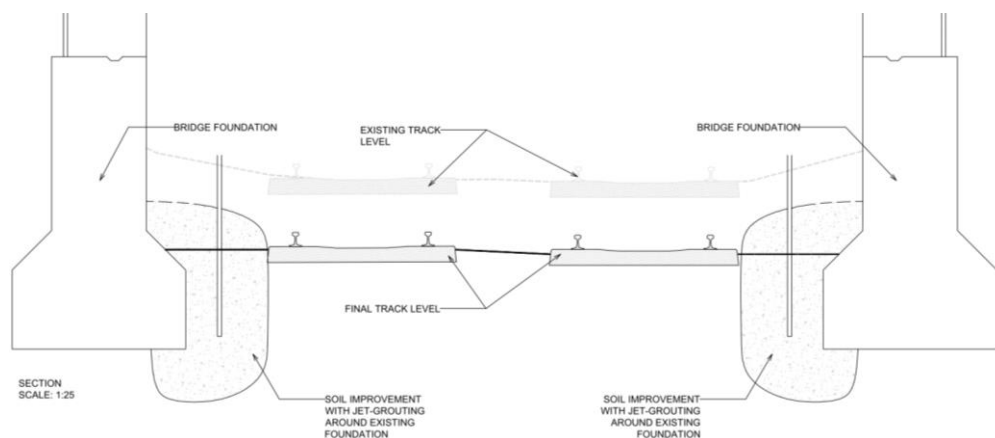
Proposed soil improvement around existing foundations prior to excavation
